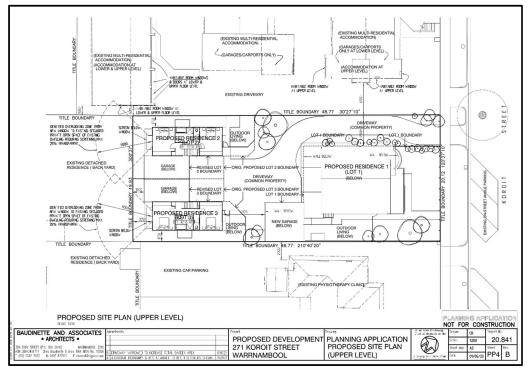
Proposed Site Plan (First Floor). Source: Application Documents.
